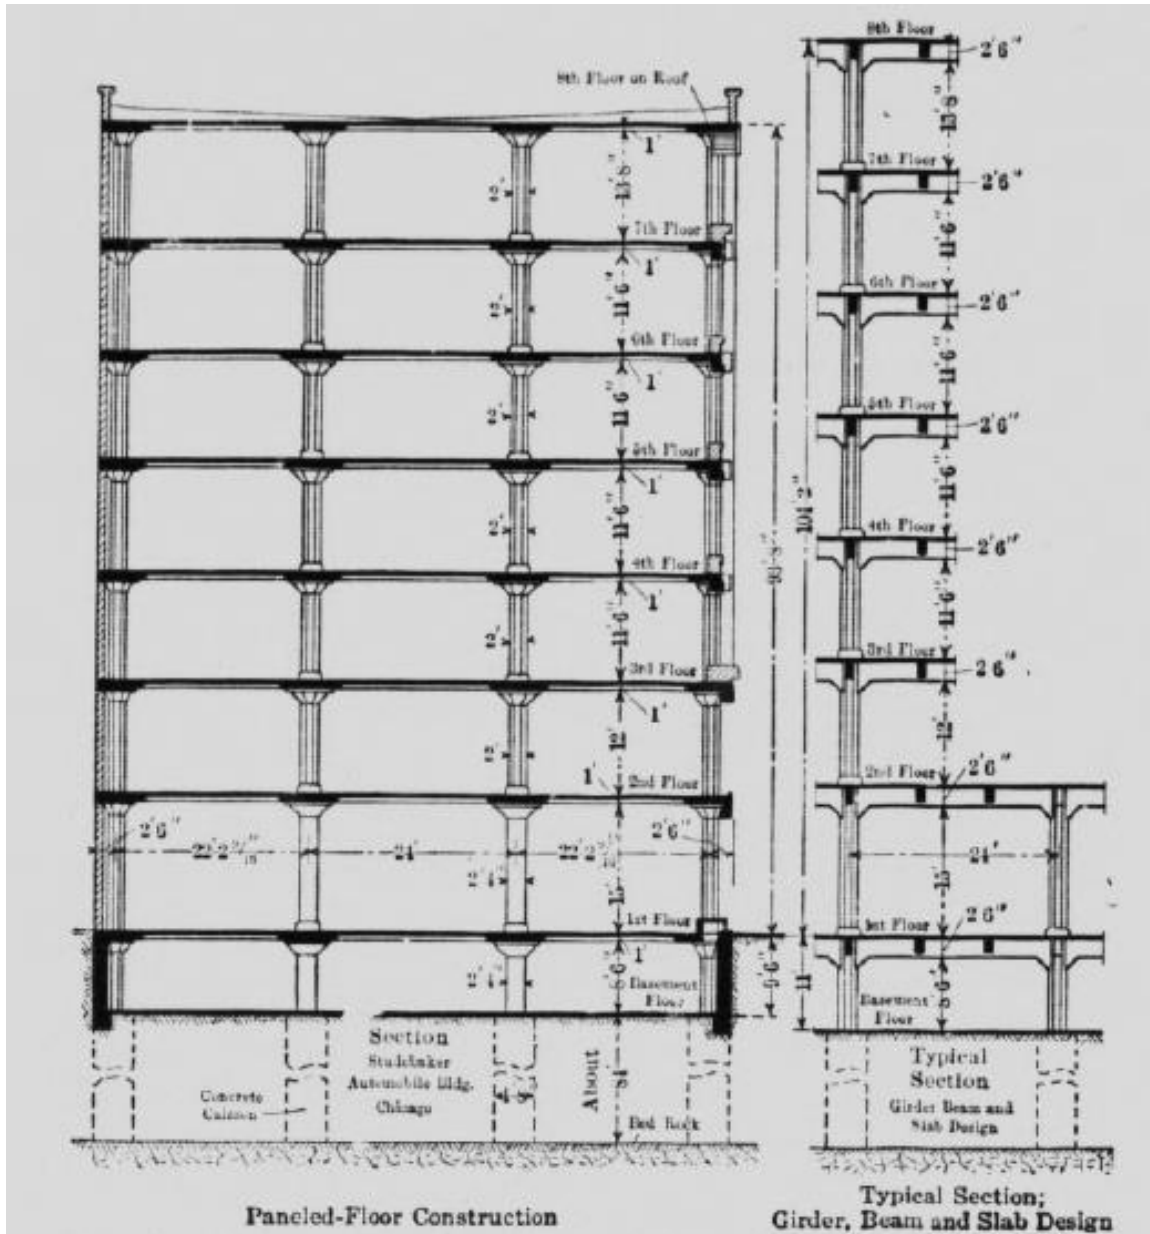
Cross-section of two types of reinforced-concrete construction for multi-story industrial buildings, showing mushroom-head columns (left) and haunched girders (right), 1912.<sup>129</sup>
